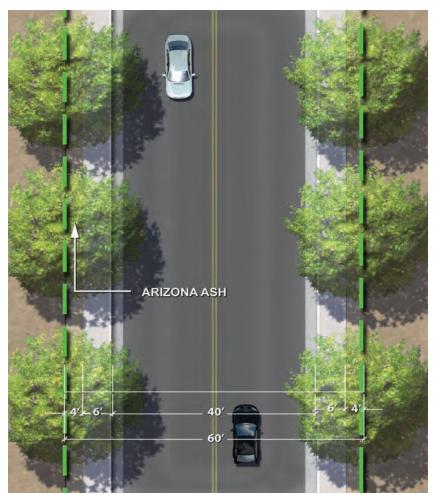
| Themed Road - F Plan (60' R.O.W.)
